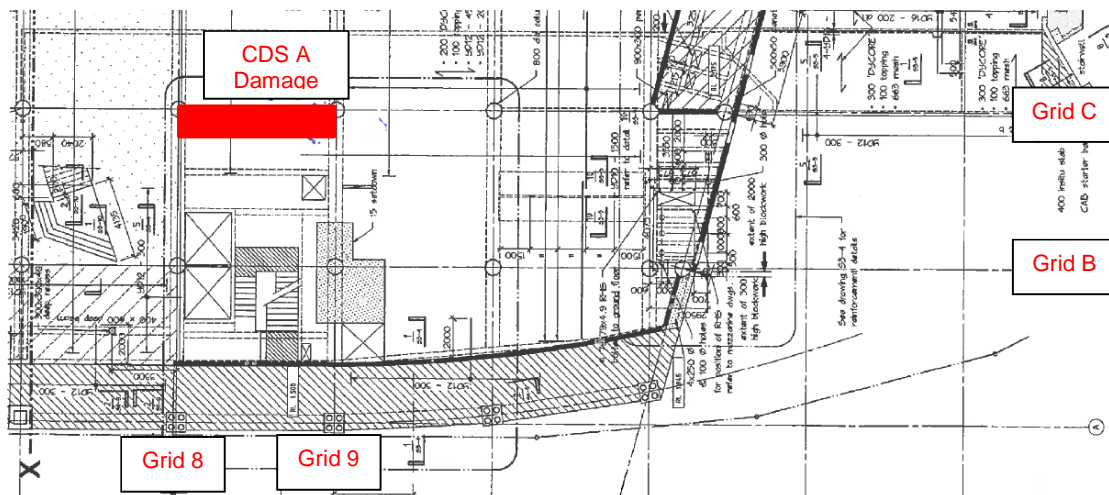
Location of transverse crack to hollowcore ground floor unit
